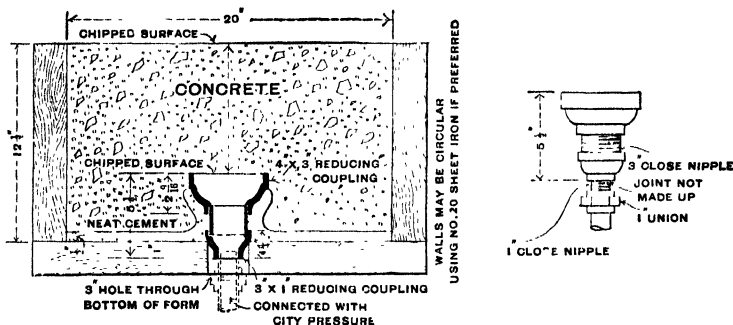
Detail of Specimen for Testing Permeability. (See p. 306.)
